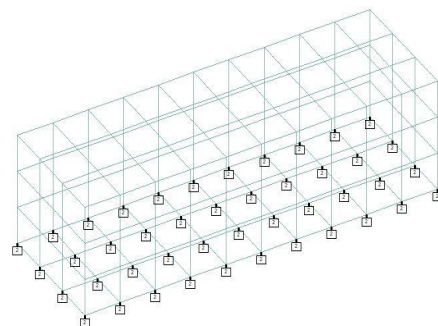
UNDERGROUND RECTANGULAR TANK DESIGN
